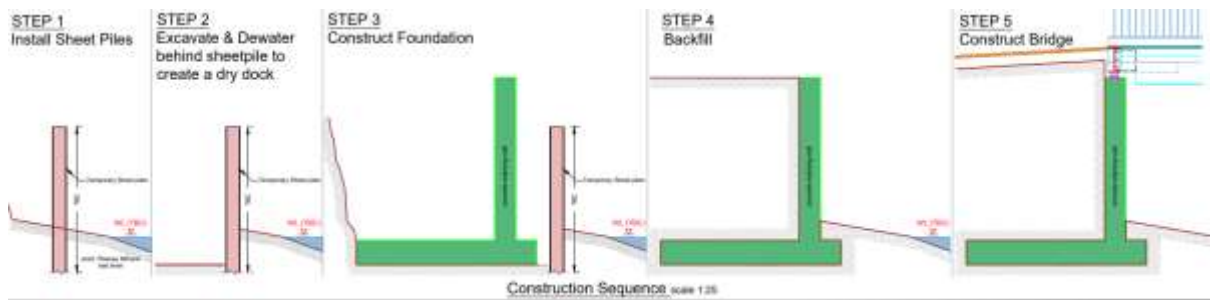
Construction sequence for abutment structures to support the steel deck of Bridge 5 (refer to drawing RHA-XX-DR-S-SP0052)
